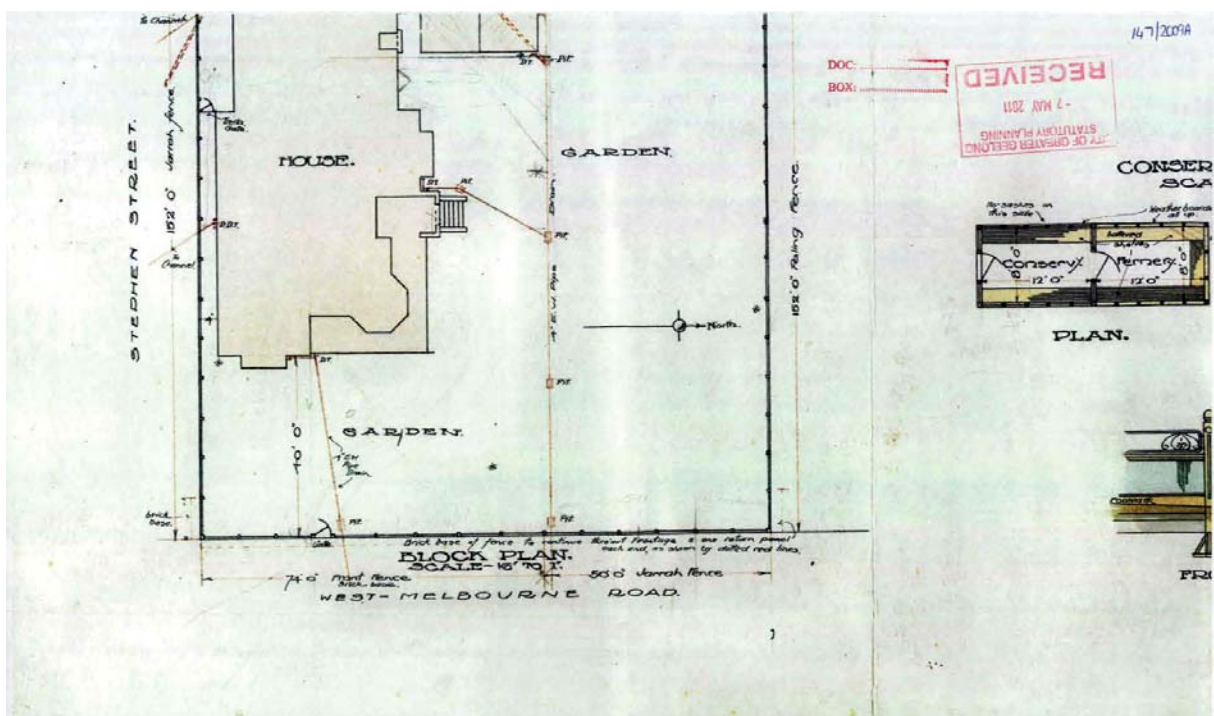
Laird & Buchan, Part of site plan of property, part plan of conservatory & fernery and part front elevation of front fence, c.1914. Source: Statutory Planning Department, City of Greater Geelong.
